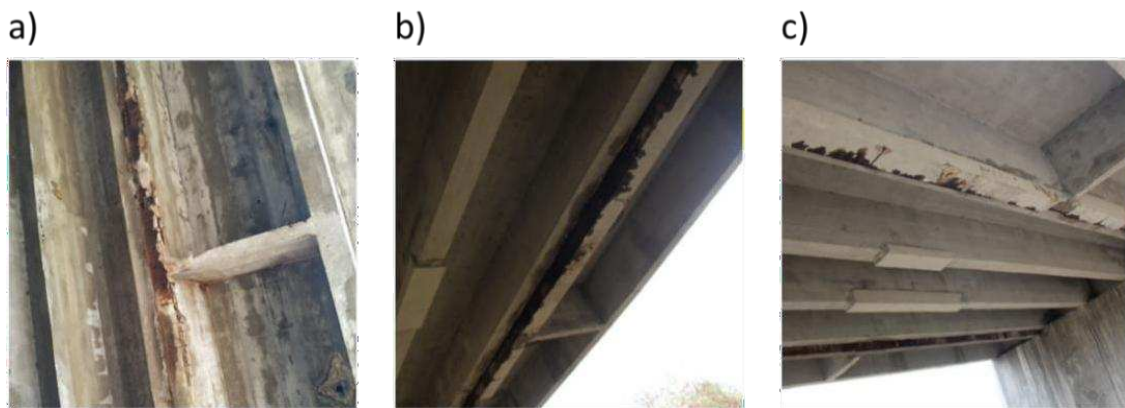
Recurring bridge damage 01 in bridge; a) Damage at 2020 inspection; b) and c) Damage at 2023 inspection
